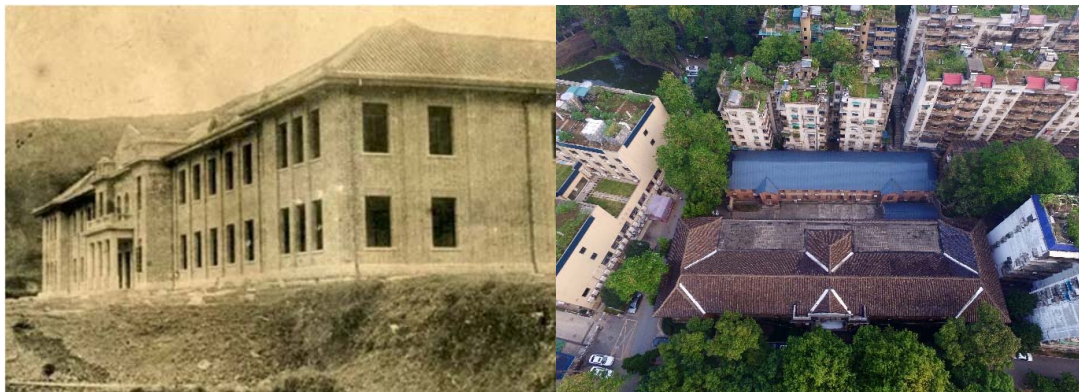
, 7 (from Left to Right): A picture showing the final stages of Teaching and Research Building Two construction; A drone view of the building coverings showing the 1980s addition flat roofing system and the original Pitched Roof.
